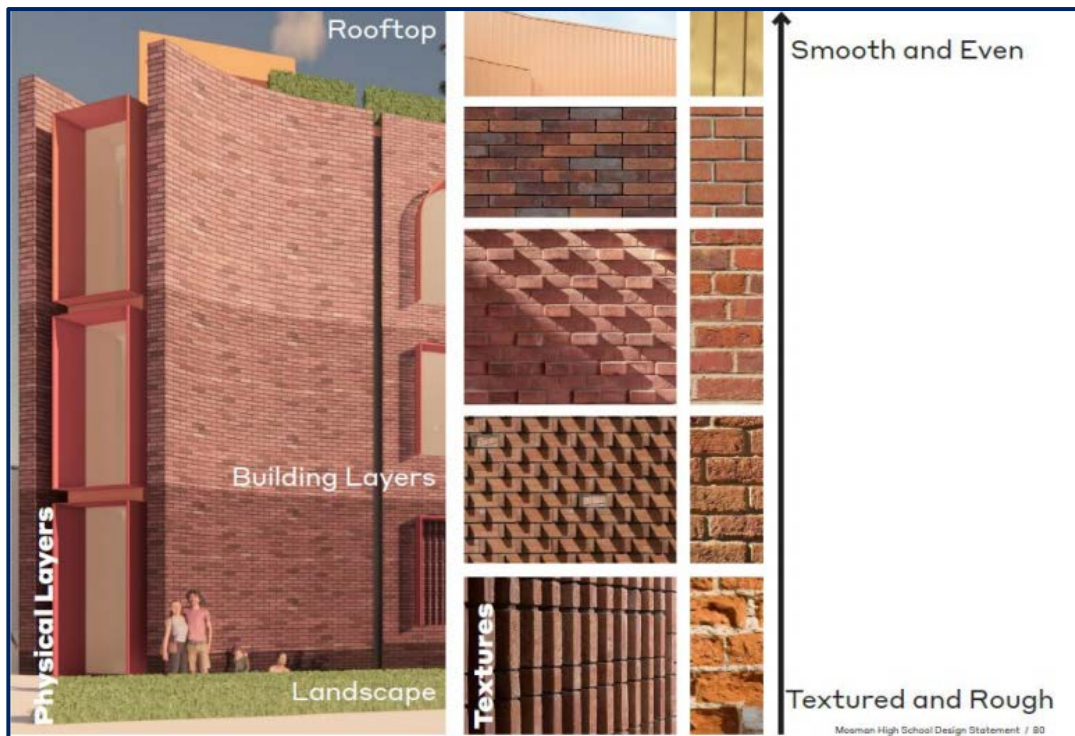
| Proposed building façade and materials and finishes (Source: Applicant's EIS, 2021)
